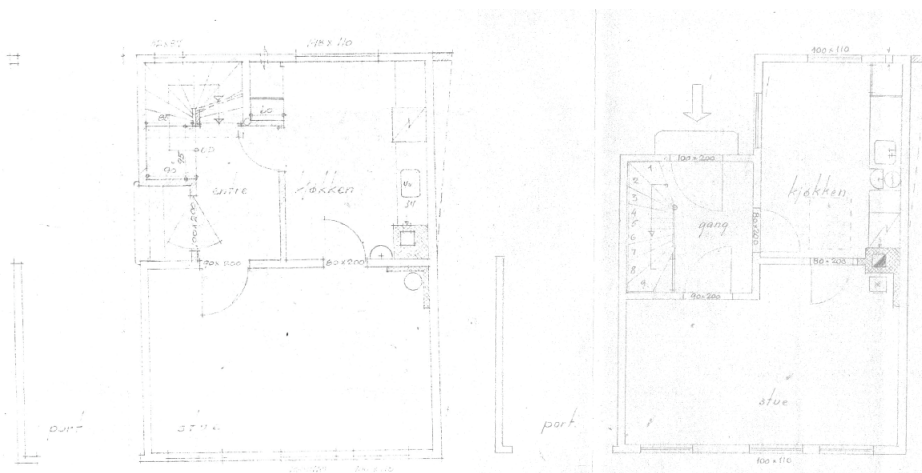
Kjerkgata 56, ground floor plan for “reconstruction of wooden home” by Johan Stensaas, from 1950 (left) and 1952 (right). The plan from 1950 included a full basement and a new staircase at the back of the house. The structural timber wall which in the old building divided the entrance and sitting room, was removed. The depth of the sitting room was the same for the old and new building which meant that this may have been preserved; however it seems that all parties at this point agreed on the plan to construct an entirely new building in the place of the historic structure. The altered proposition of 1952 was the basis for the reconstruction, although it became taller than Stensaas' plans proposed. . (Architect J. Stensaas, 25/2-1950; 23/2-1952. Røros municipal building archive)
